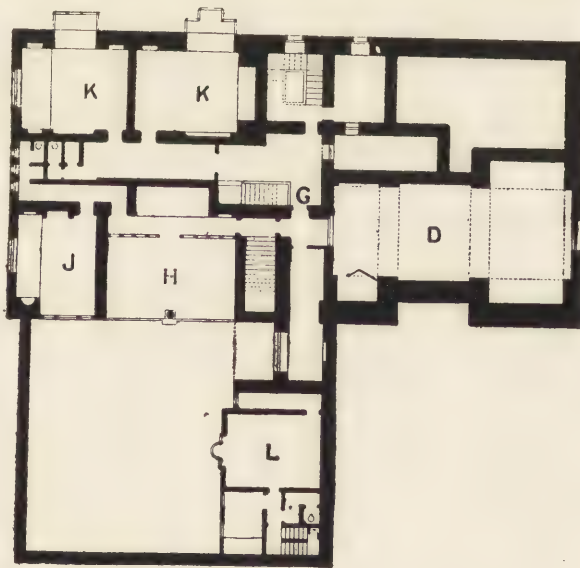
A HOUSE IN CAIRO: FIRST-FLOOR PLAN.
